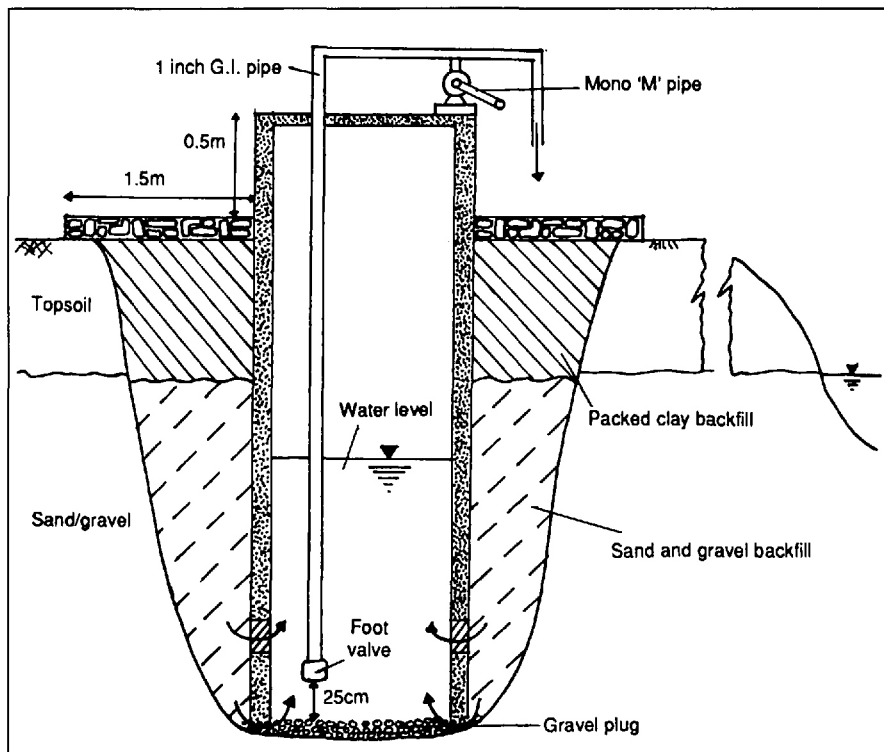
A typical infiltration well (not to scale). The culvert pipes can be 40, 60, or 80cm internal diameter.
